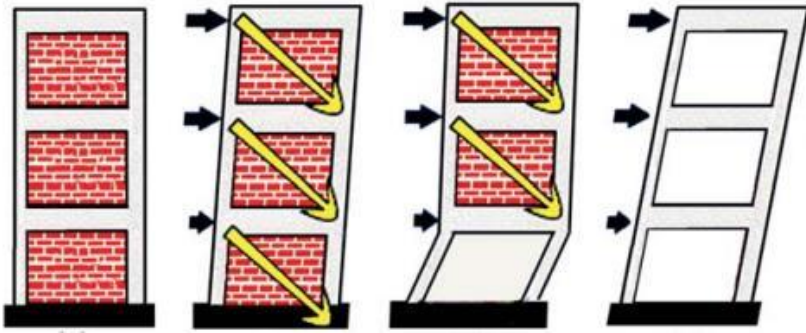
Seismic floor displacement of a reinforced concrete structure depending on the infill condition (Kaplan, 2008).
